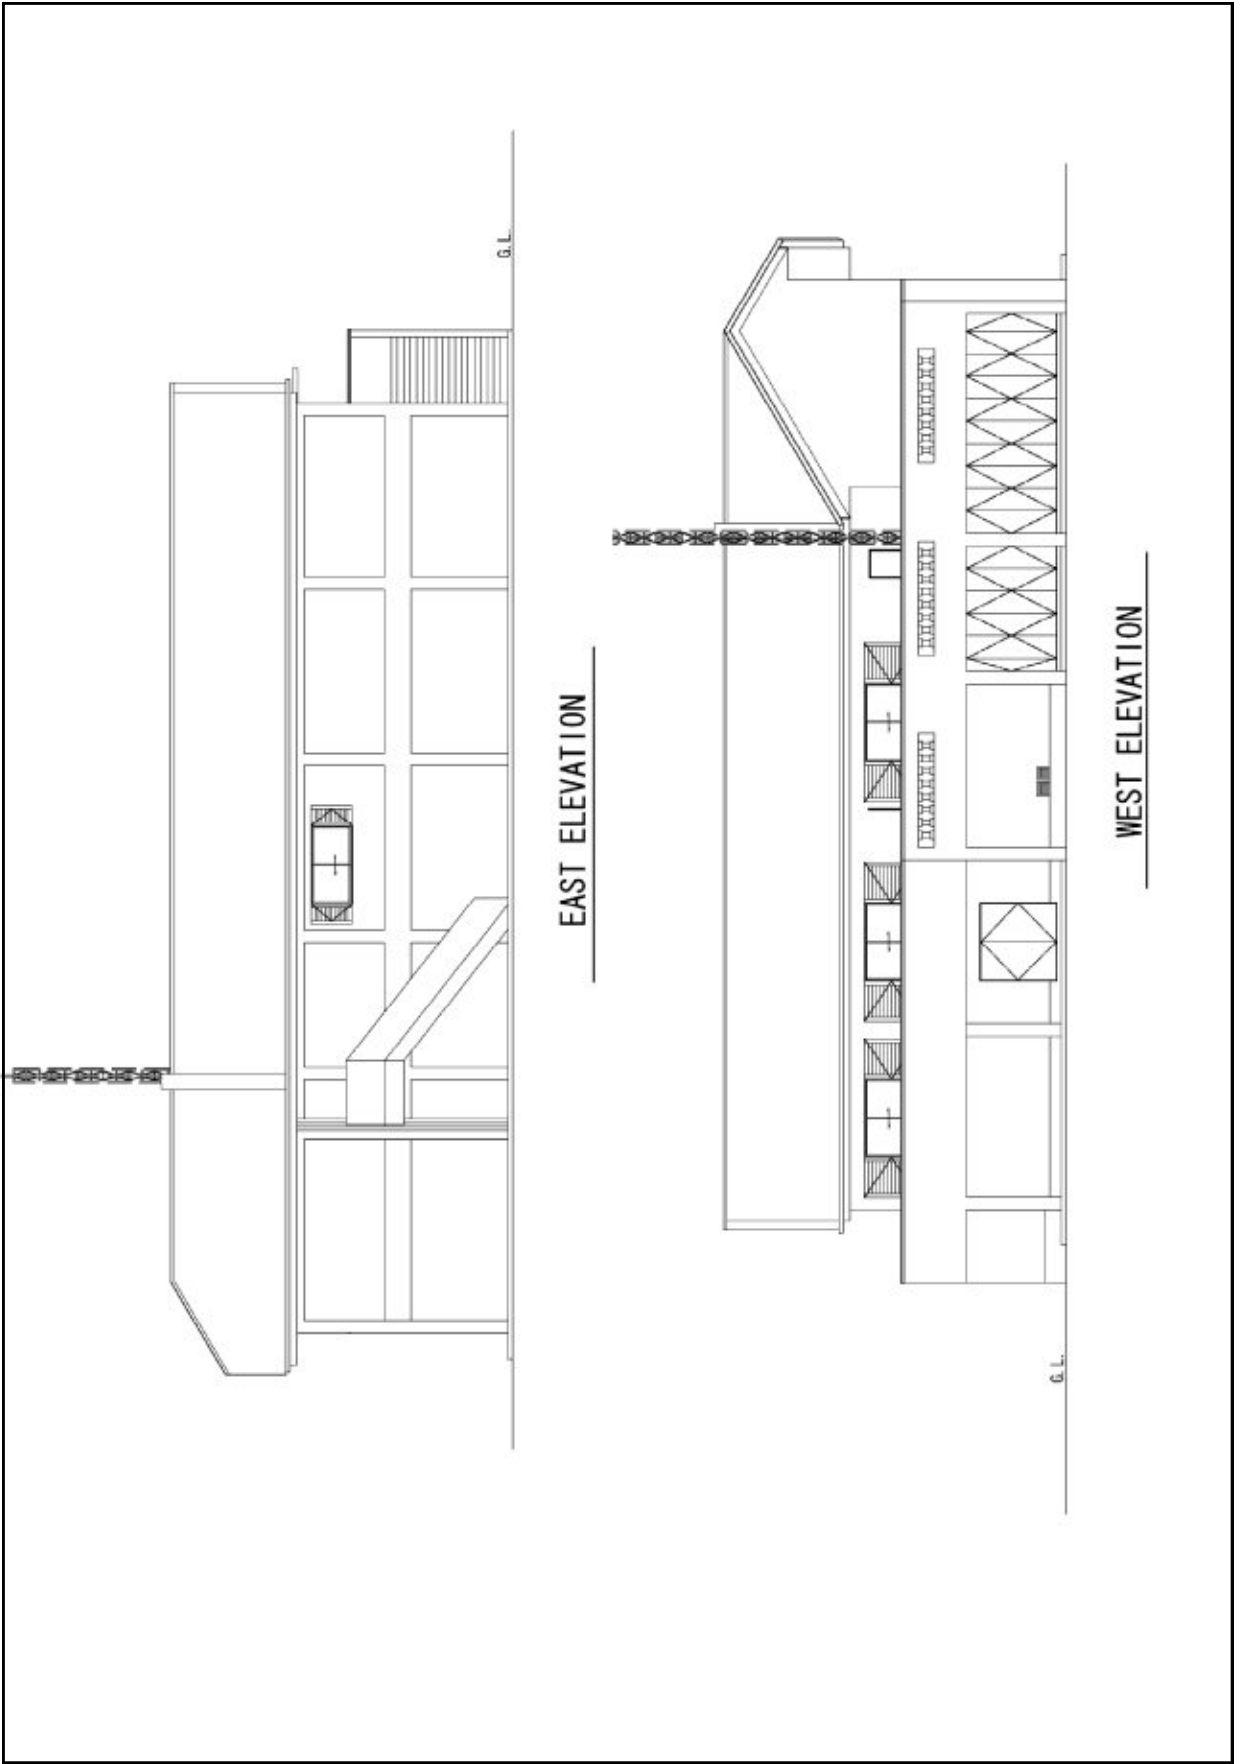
(18) Elevation Plan of New Fisheries Center (East, West)
